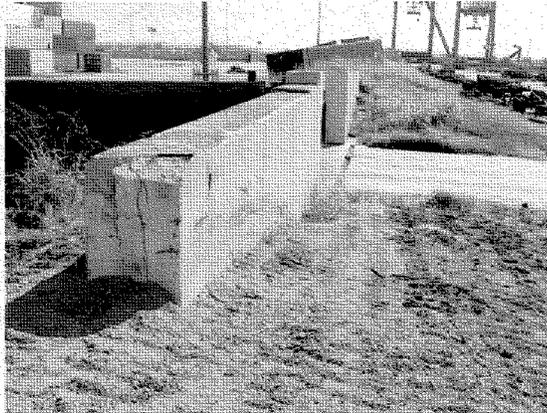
Common structural wall (with flood gate) and earthen levee transition problem with erosion at the contact between the earth and concrete sections.
